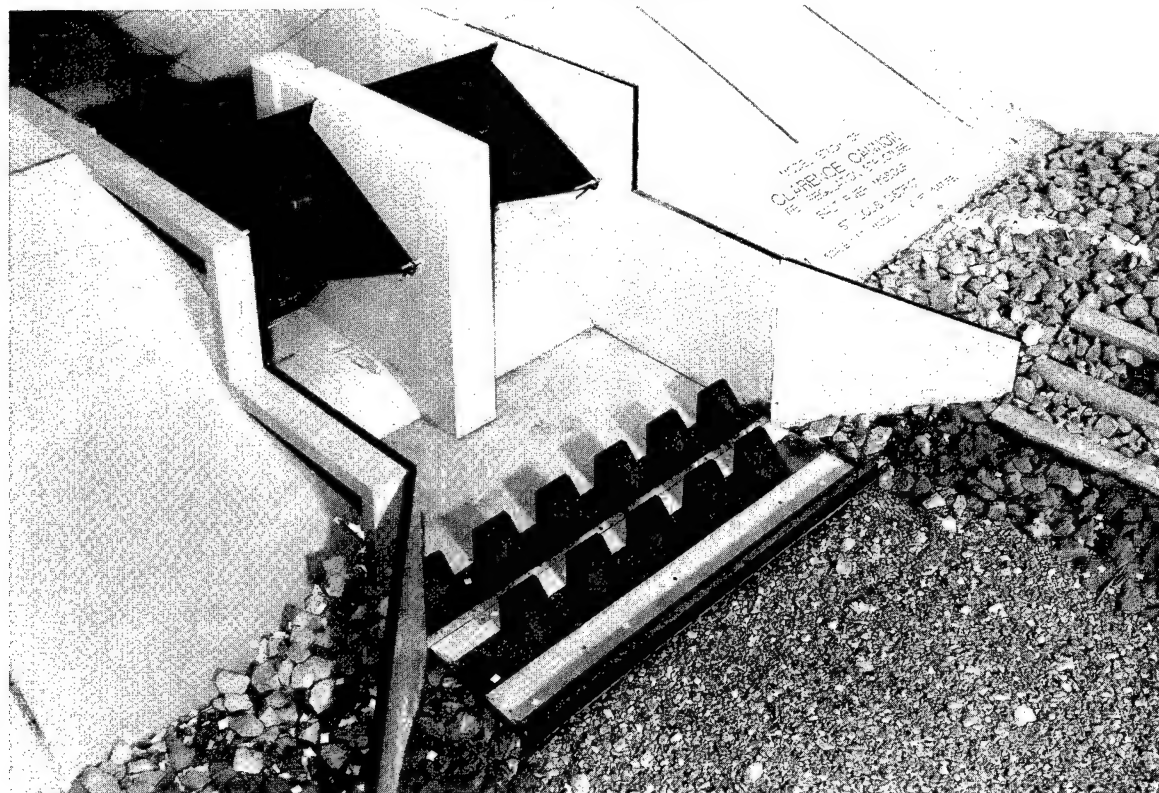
Type 4 design, stilling basin length extended 6 m (20 ft) (sidewall extensions removed)
